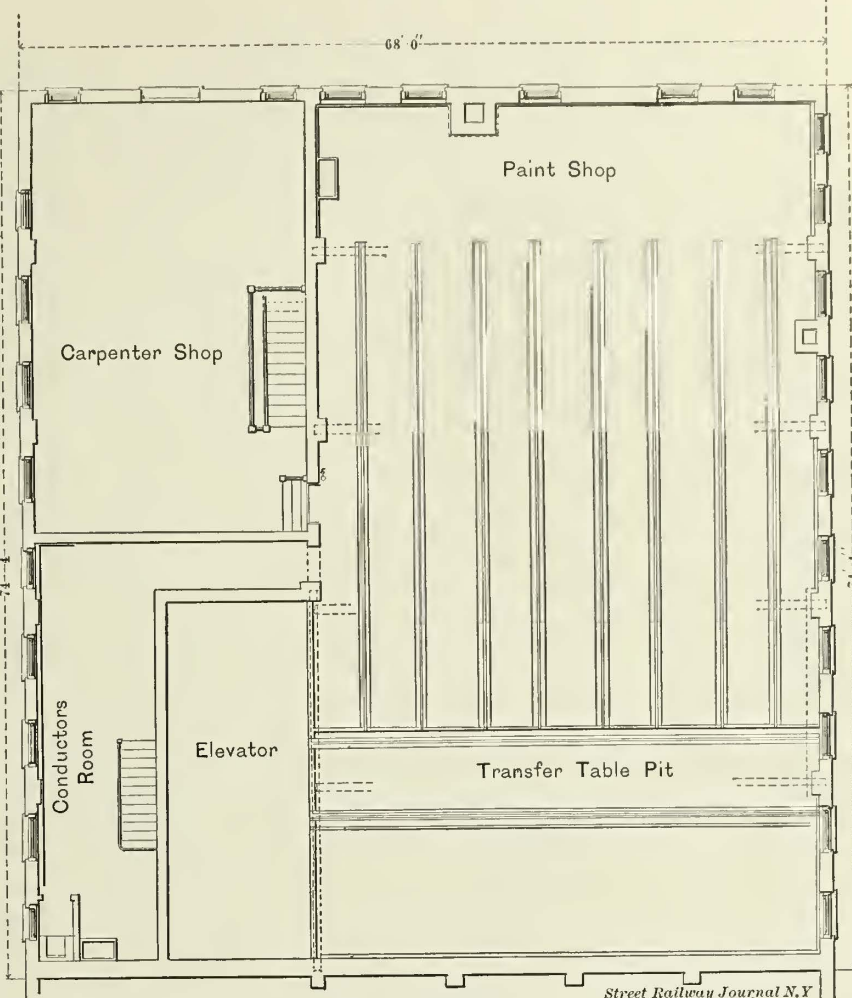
PLAN OF SECOND FLOOR OF CAR HOUSE—PEOPLE'S STREET RAILWAY.
